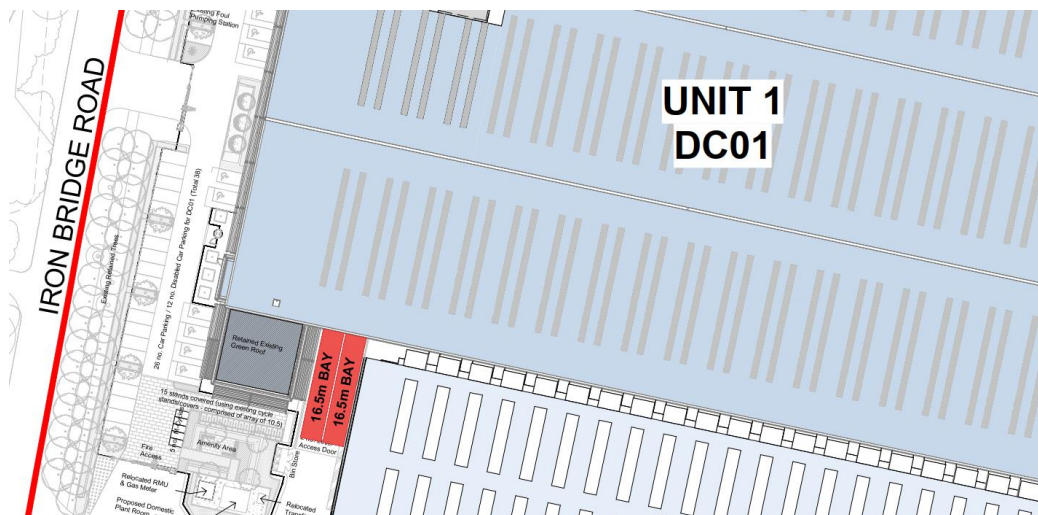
DC01 (Unit 1) Loading Bay Locations
